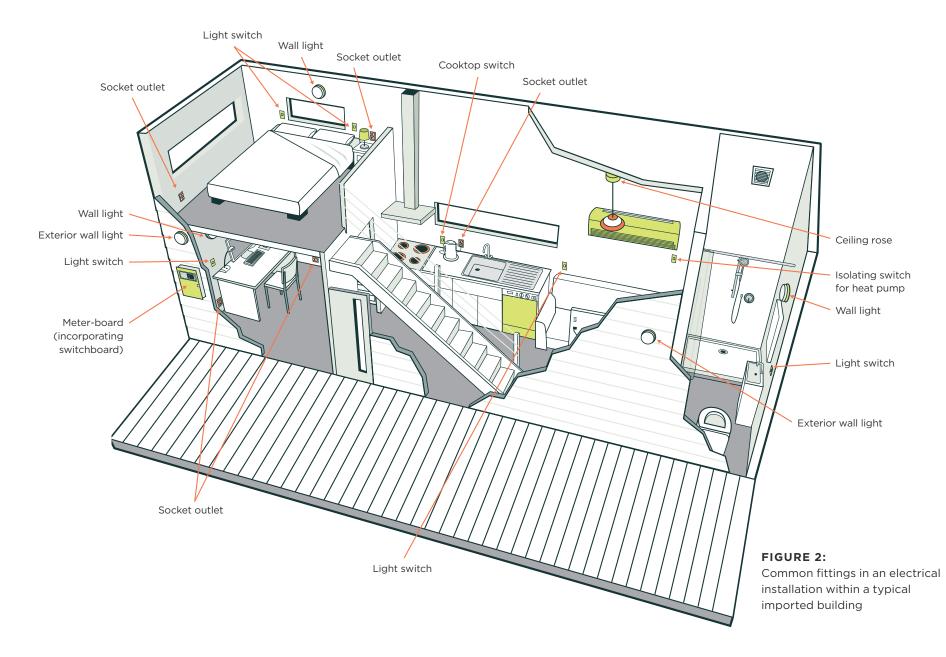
shows common fittings in an electrical installation within a typical imported building.
